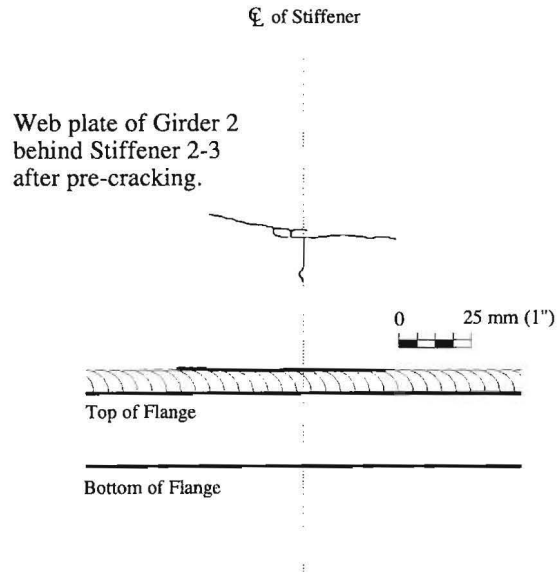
Pre-cracking in web plate of Girder 2 behind Stiffener 3.
